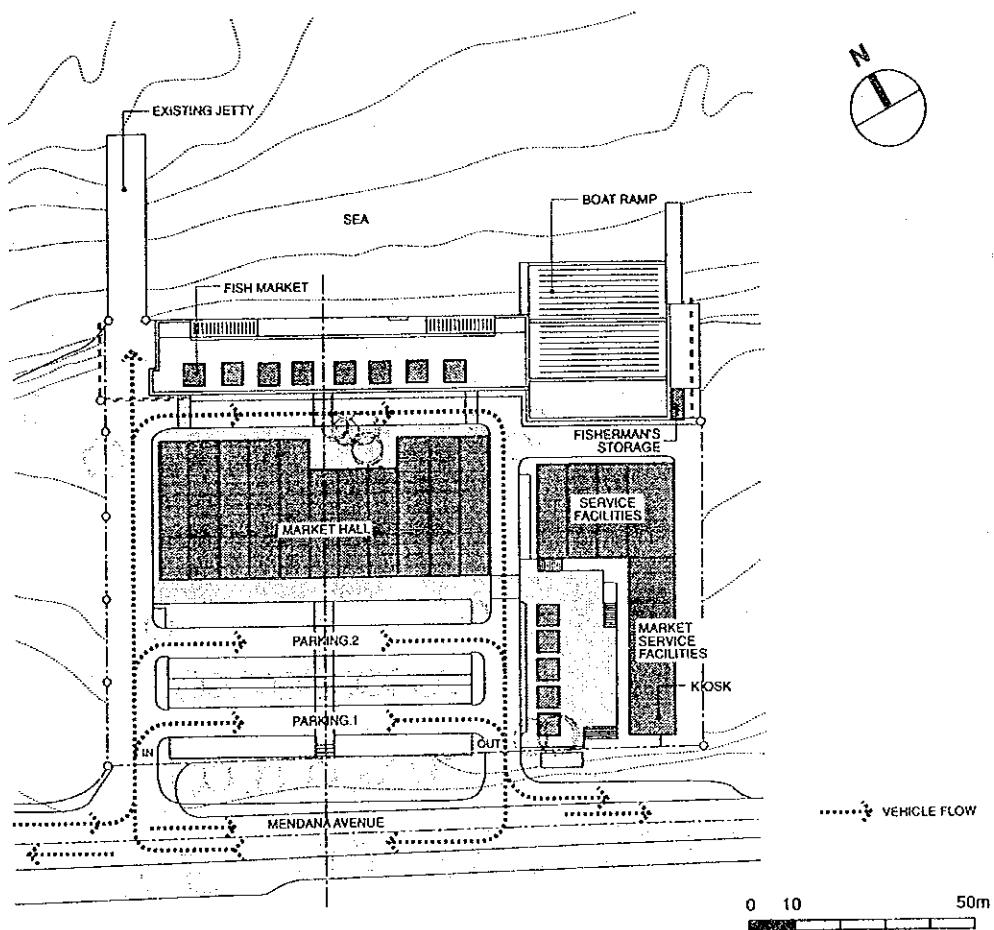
Layout Plan of Honiara Central Market
